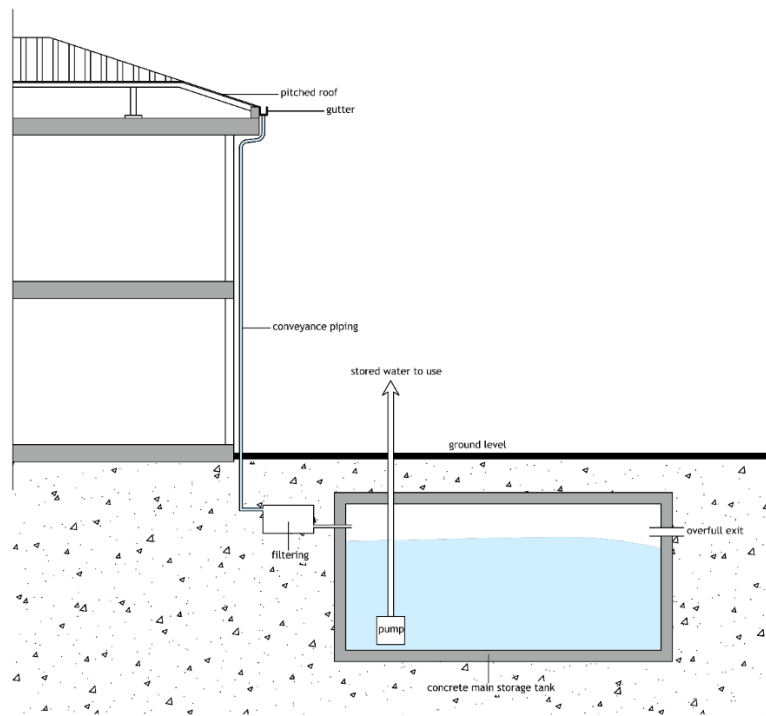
Pitched roof rainwater collecting system [URL 66]
